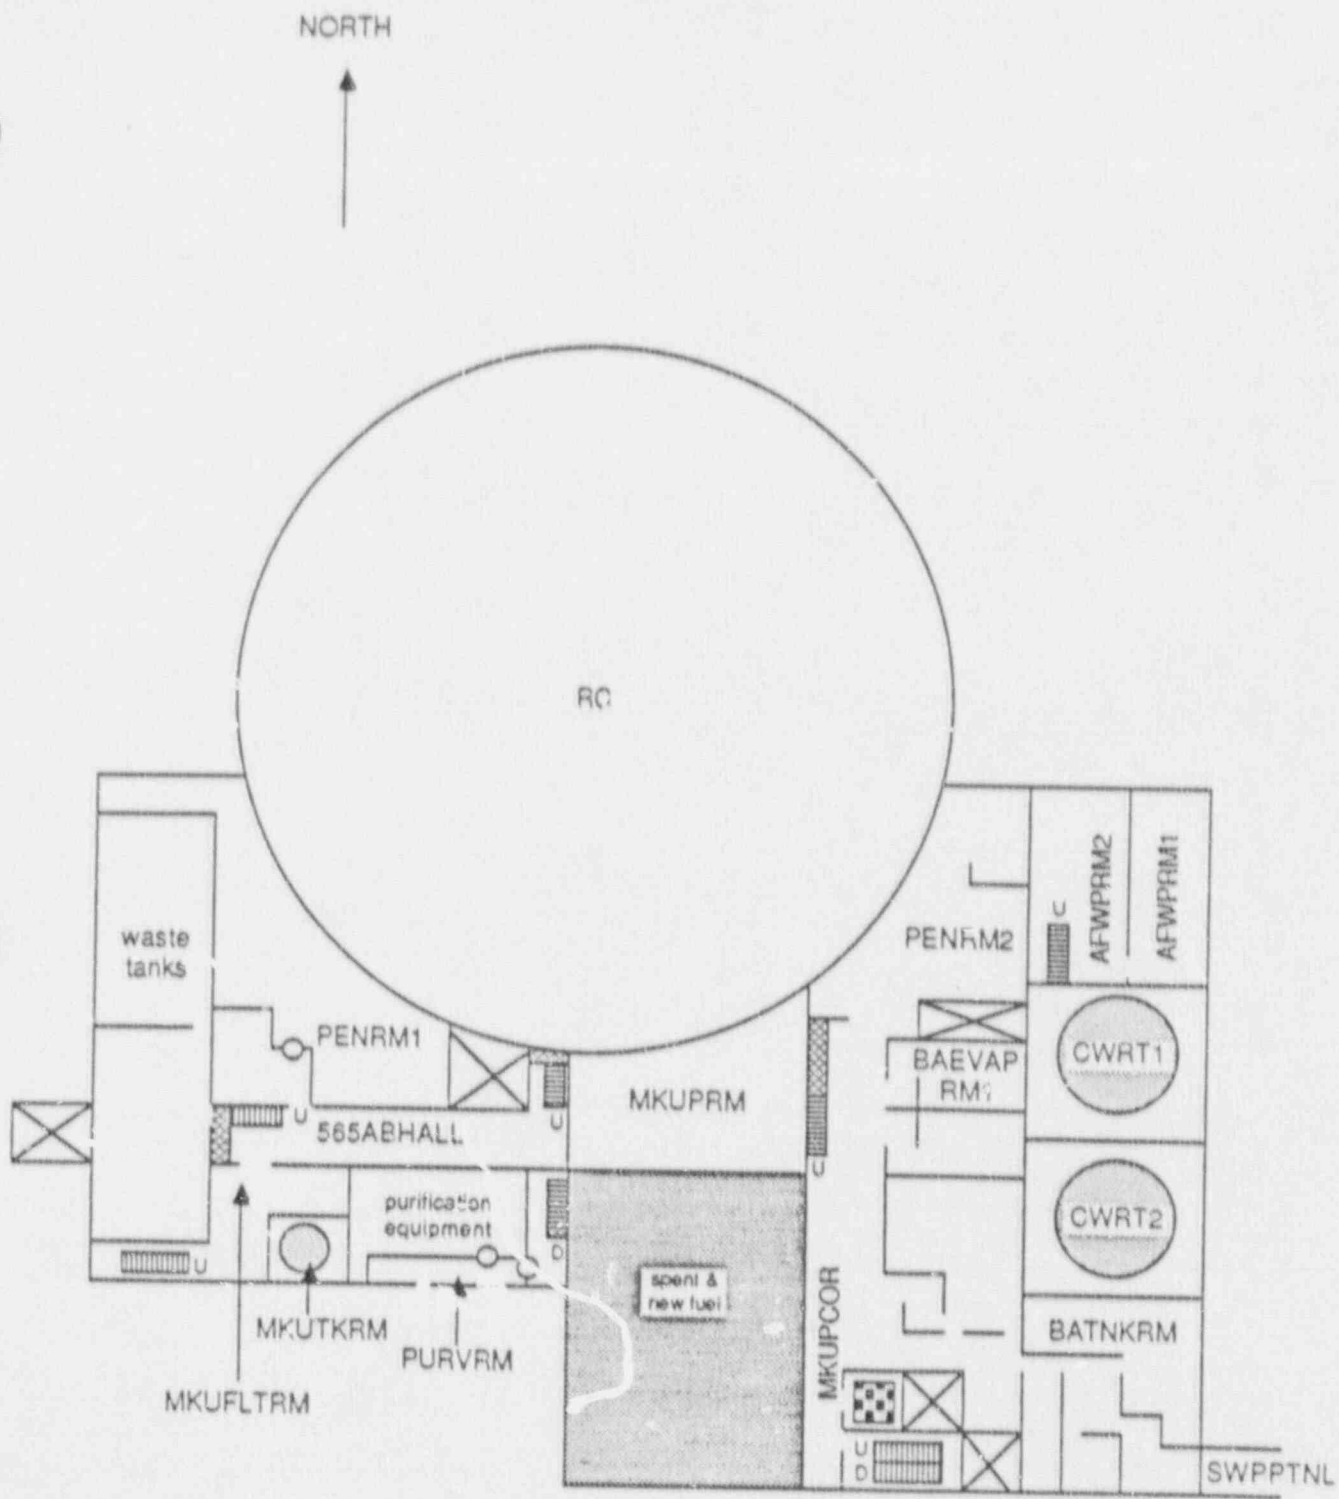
Davis-Besse Containment and Auxiliary Buildings, Elevation 565 feet
